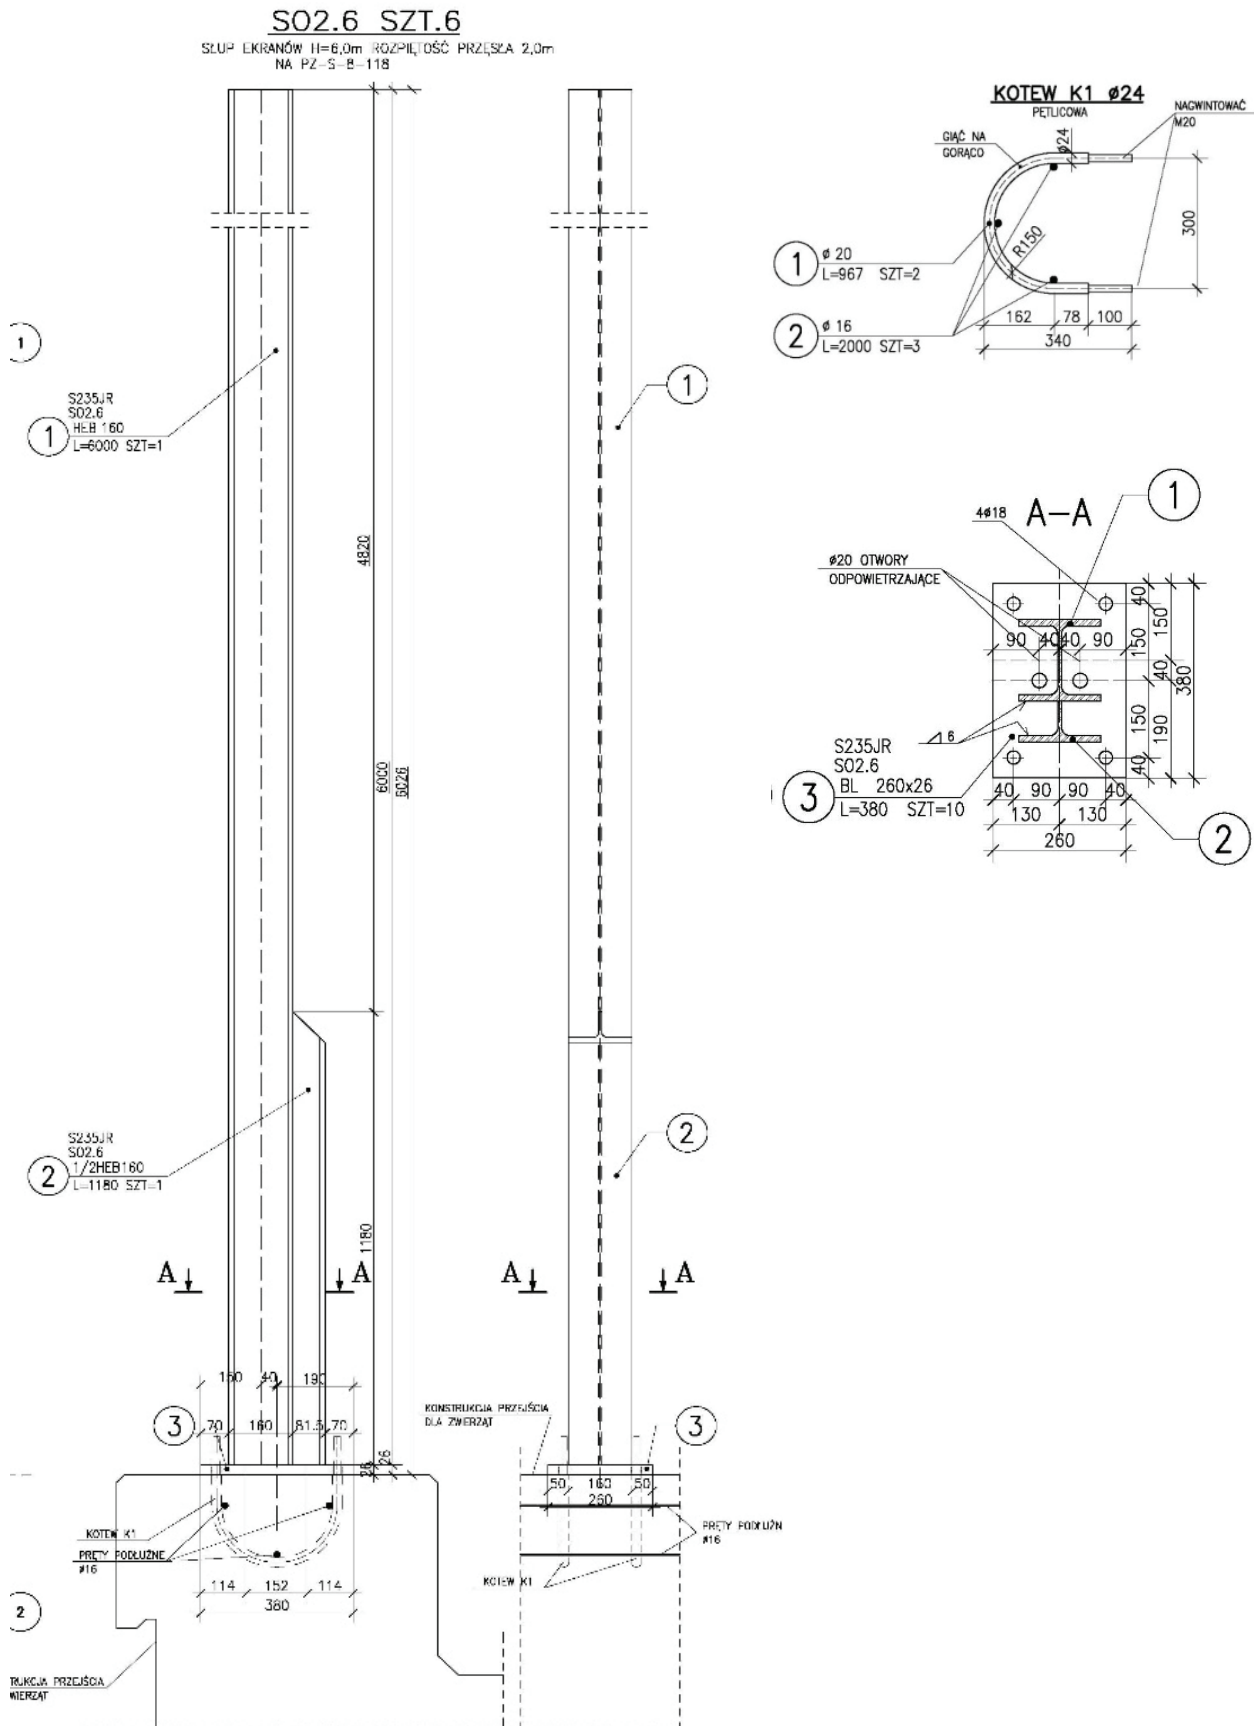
Technical drawing of columns construction elements „S2.6 - PZ-S-8-118”
